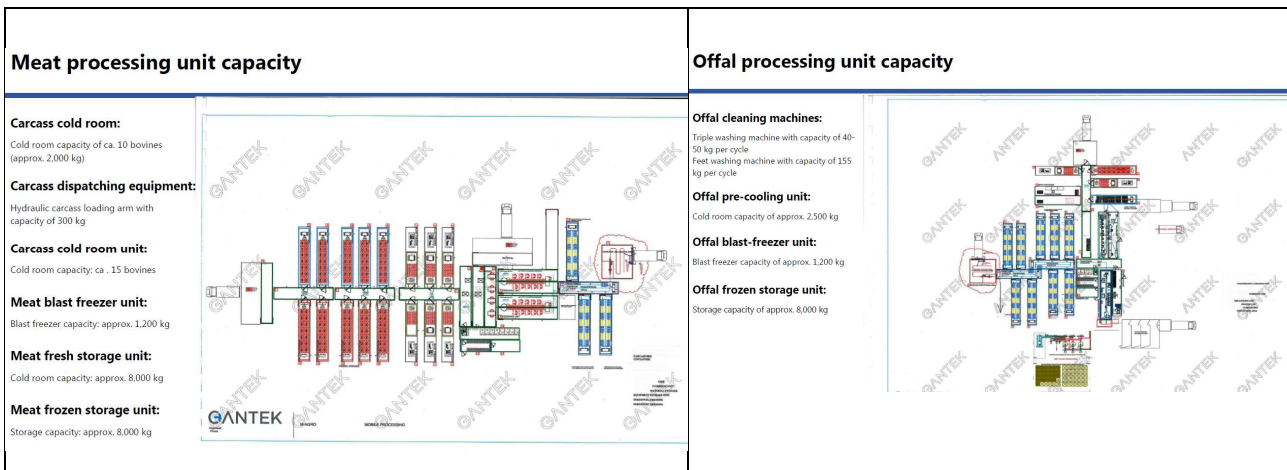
Detailed layout of cattle slaughterhouse and meat processing facility, late 2023. Metagro
